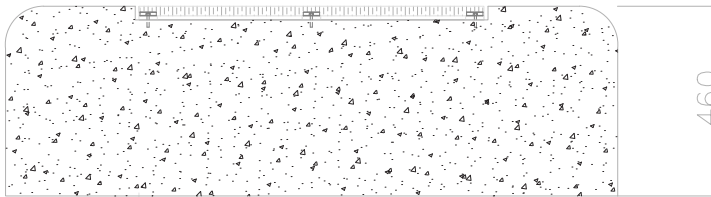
Detail 5.2-Composite timber and concrete bench section detail - not to scale (Author: 2013)
